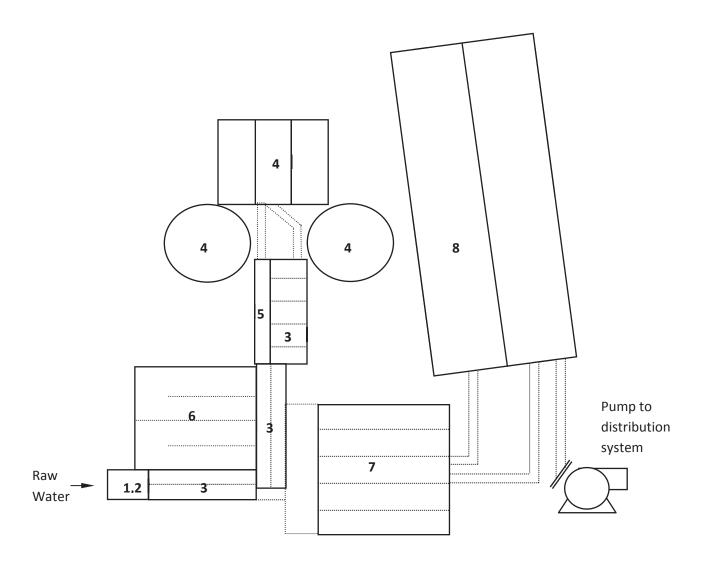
SPRWS McCarrons Water Treatment Plant Layout
